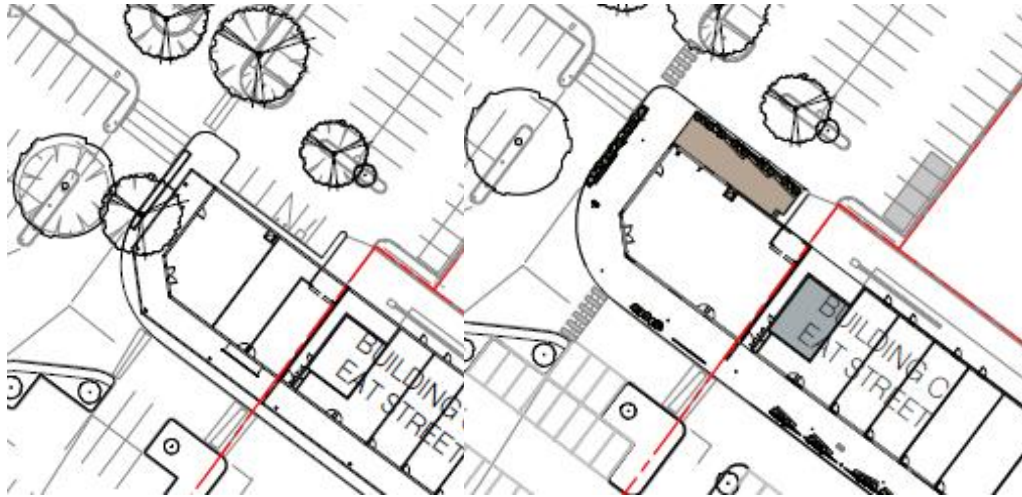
Car parking space to be converted to outdoor dining (existing left, proposed right)
